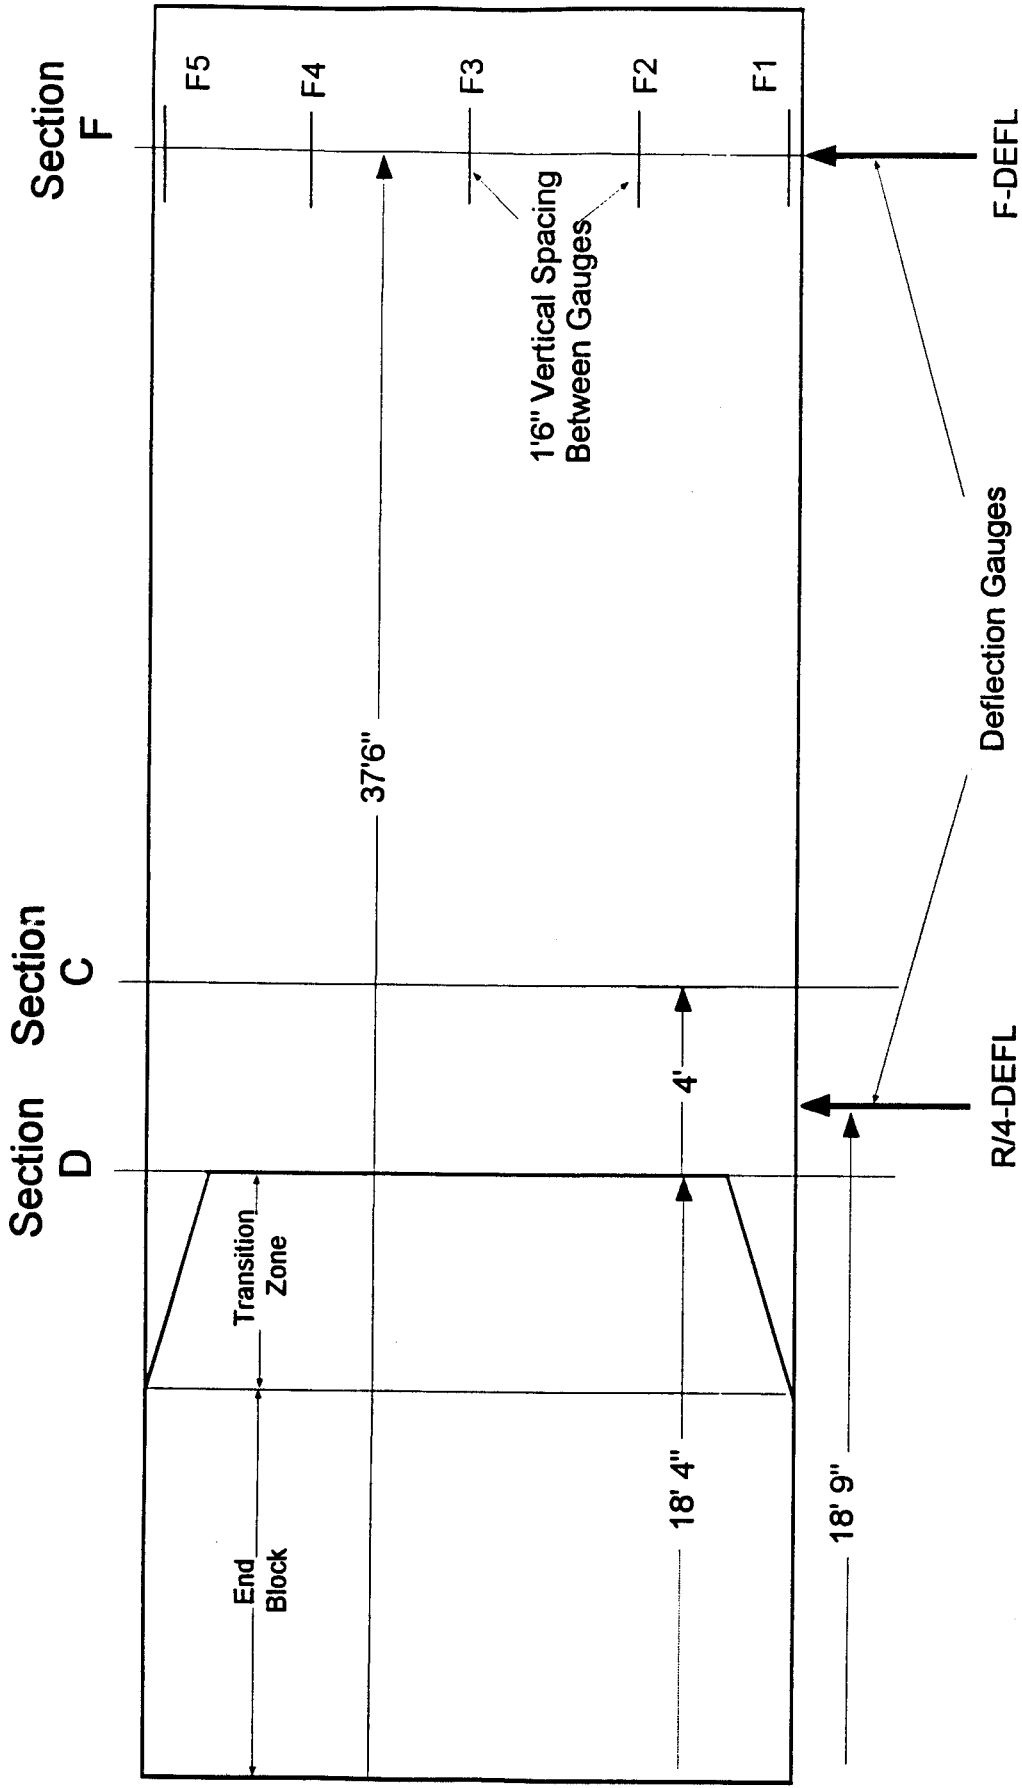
Location of Instrumented Sections on Girder with Round Ducts
